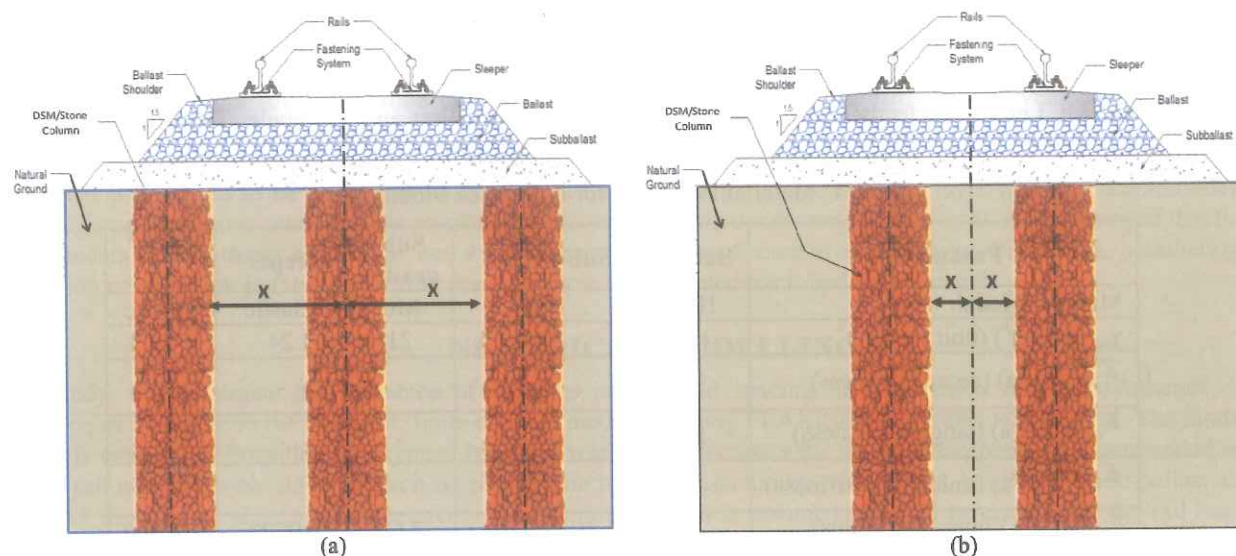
Column pattern to improve railway formation (a) three columns in cross section, and (b) two columns in cross section
